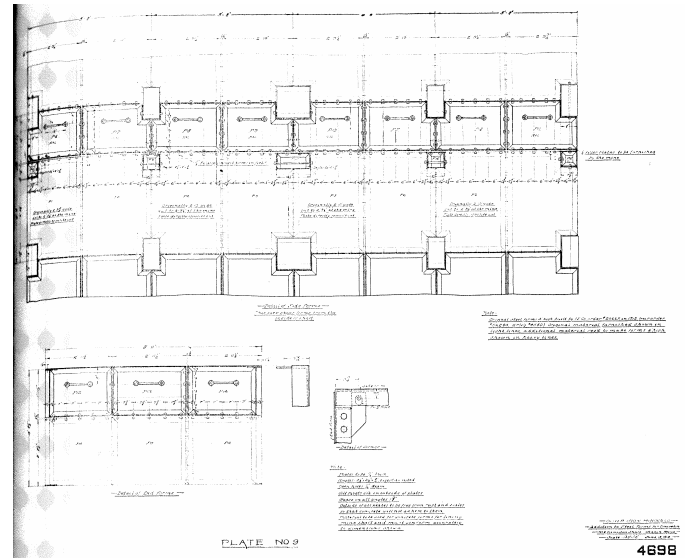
Steel Forms Made in Sections, With Recesses to Support End Plates and Dividers
